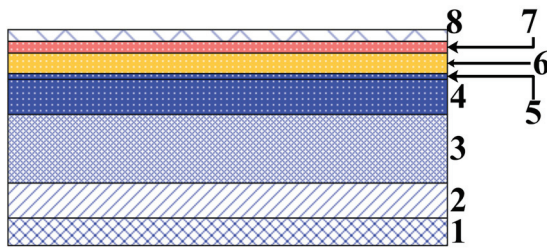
Typical layout of roof construction: 1—cement plaster, 2—thermal insulation, 3—reinforced concrete, 4—foam concrete, 5—membrane, 6—sand fill, 7—mortar bed, 8—tiles/coatings.
